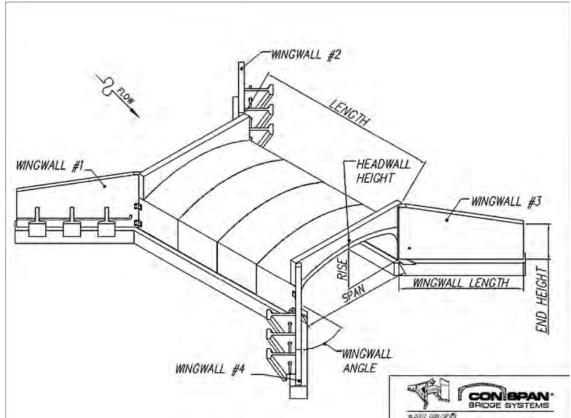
Typical Pre-Cast Three-Sided Bridge with Arched Roof
